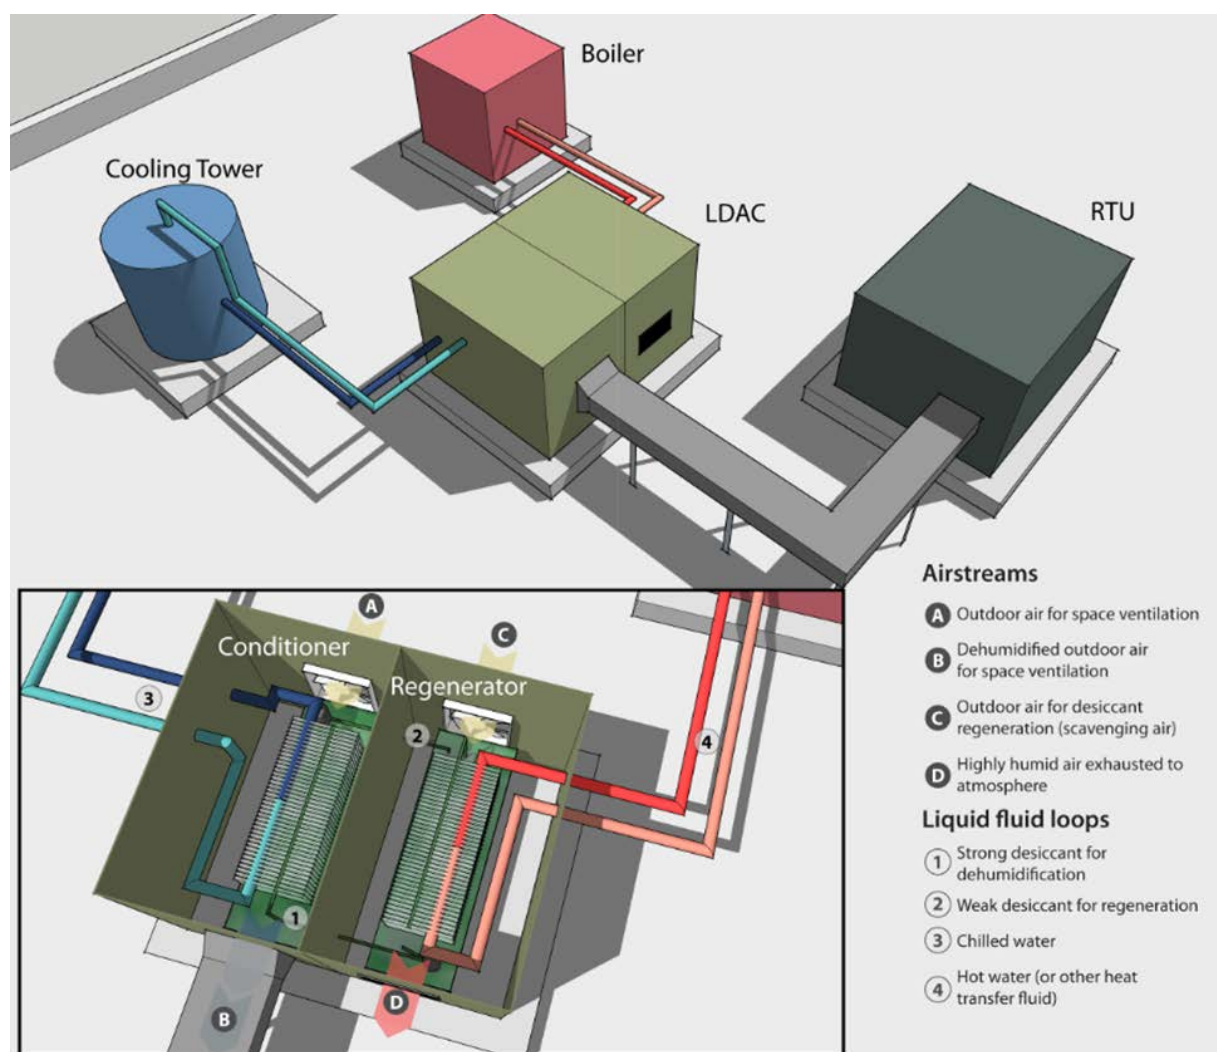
Installation example of a prototype roof-mounted LDAC.
